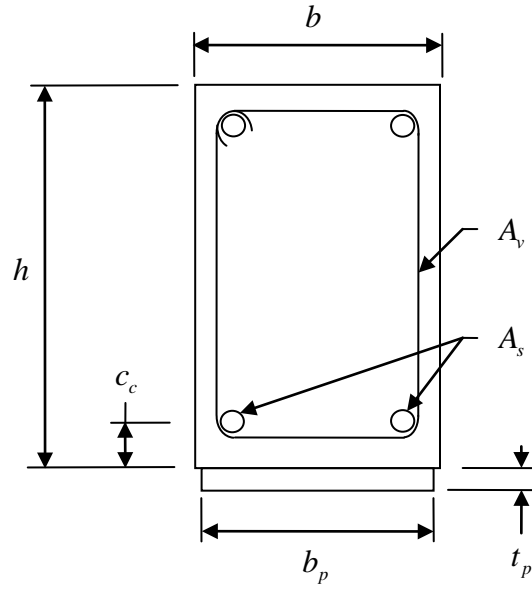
Typical Specimen Cross-Section used by Yao and Teng (2007)
